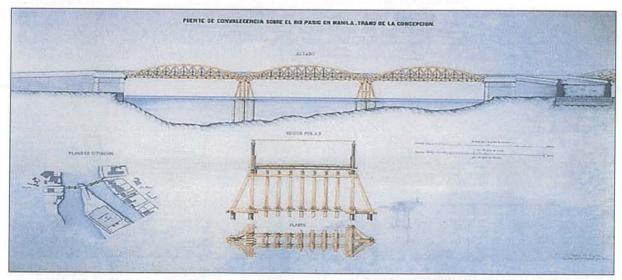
Ayala Bridge (South Span Side)
